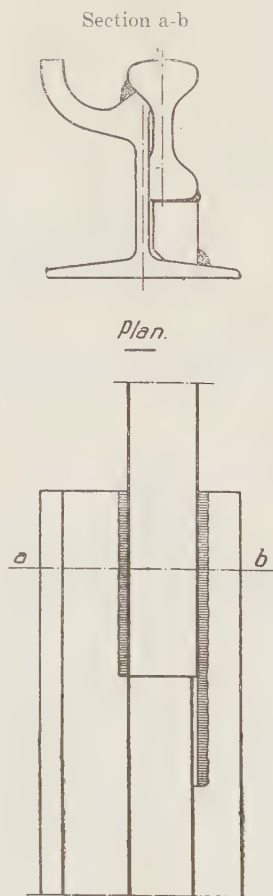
Electric arc weld of a grooved rail with a double-headed rail (*French State*).
